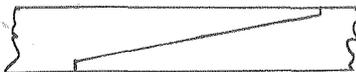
Lap or Bevel Joint of Two Pieces of Timber
